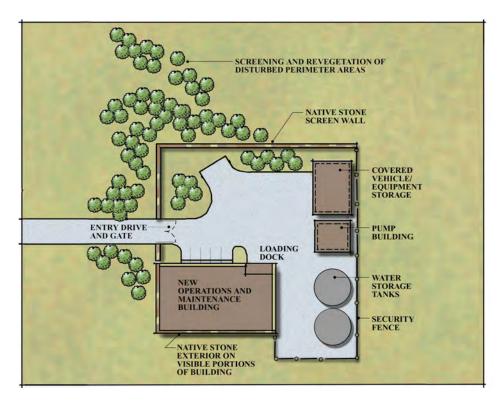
A: Conceptual Site Plan Park Operations and Maintenance Center
